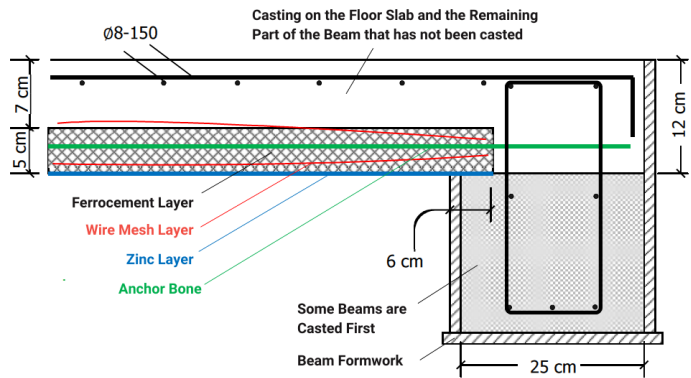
Zinc-coated ferrocement plate formwork detail A.
